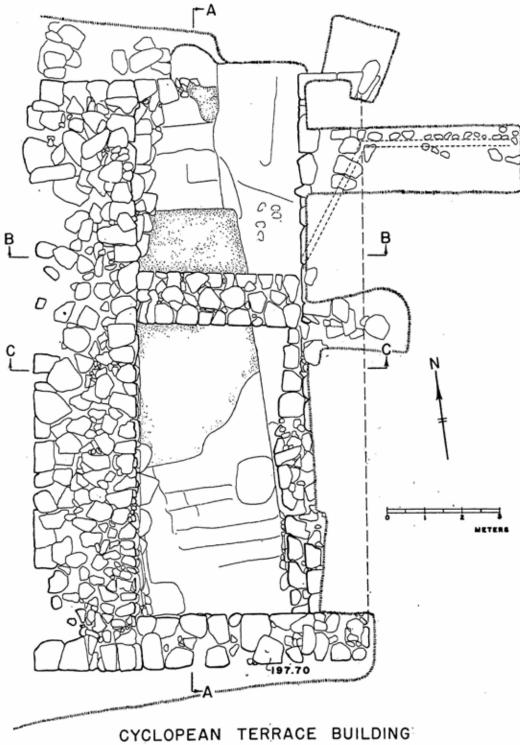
MYCENAE: CYCLOPEAN TERRACE BUILDING, PLAN.
